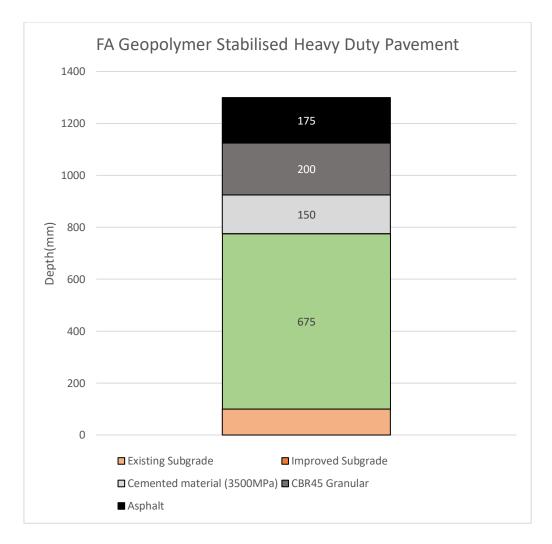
Fly ash geopolymer stabilised heavy duty pavement design (Author 2019)
